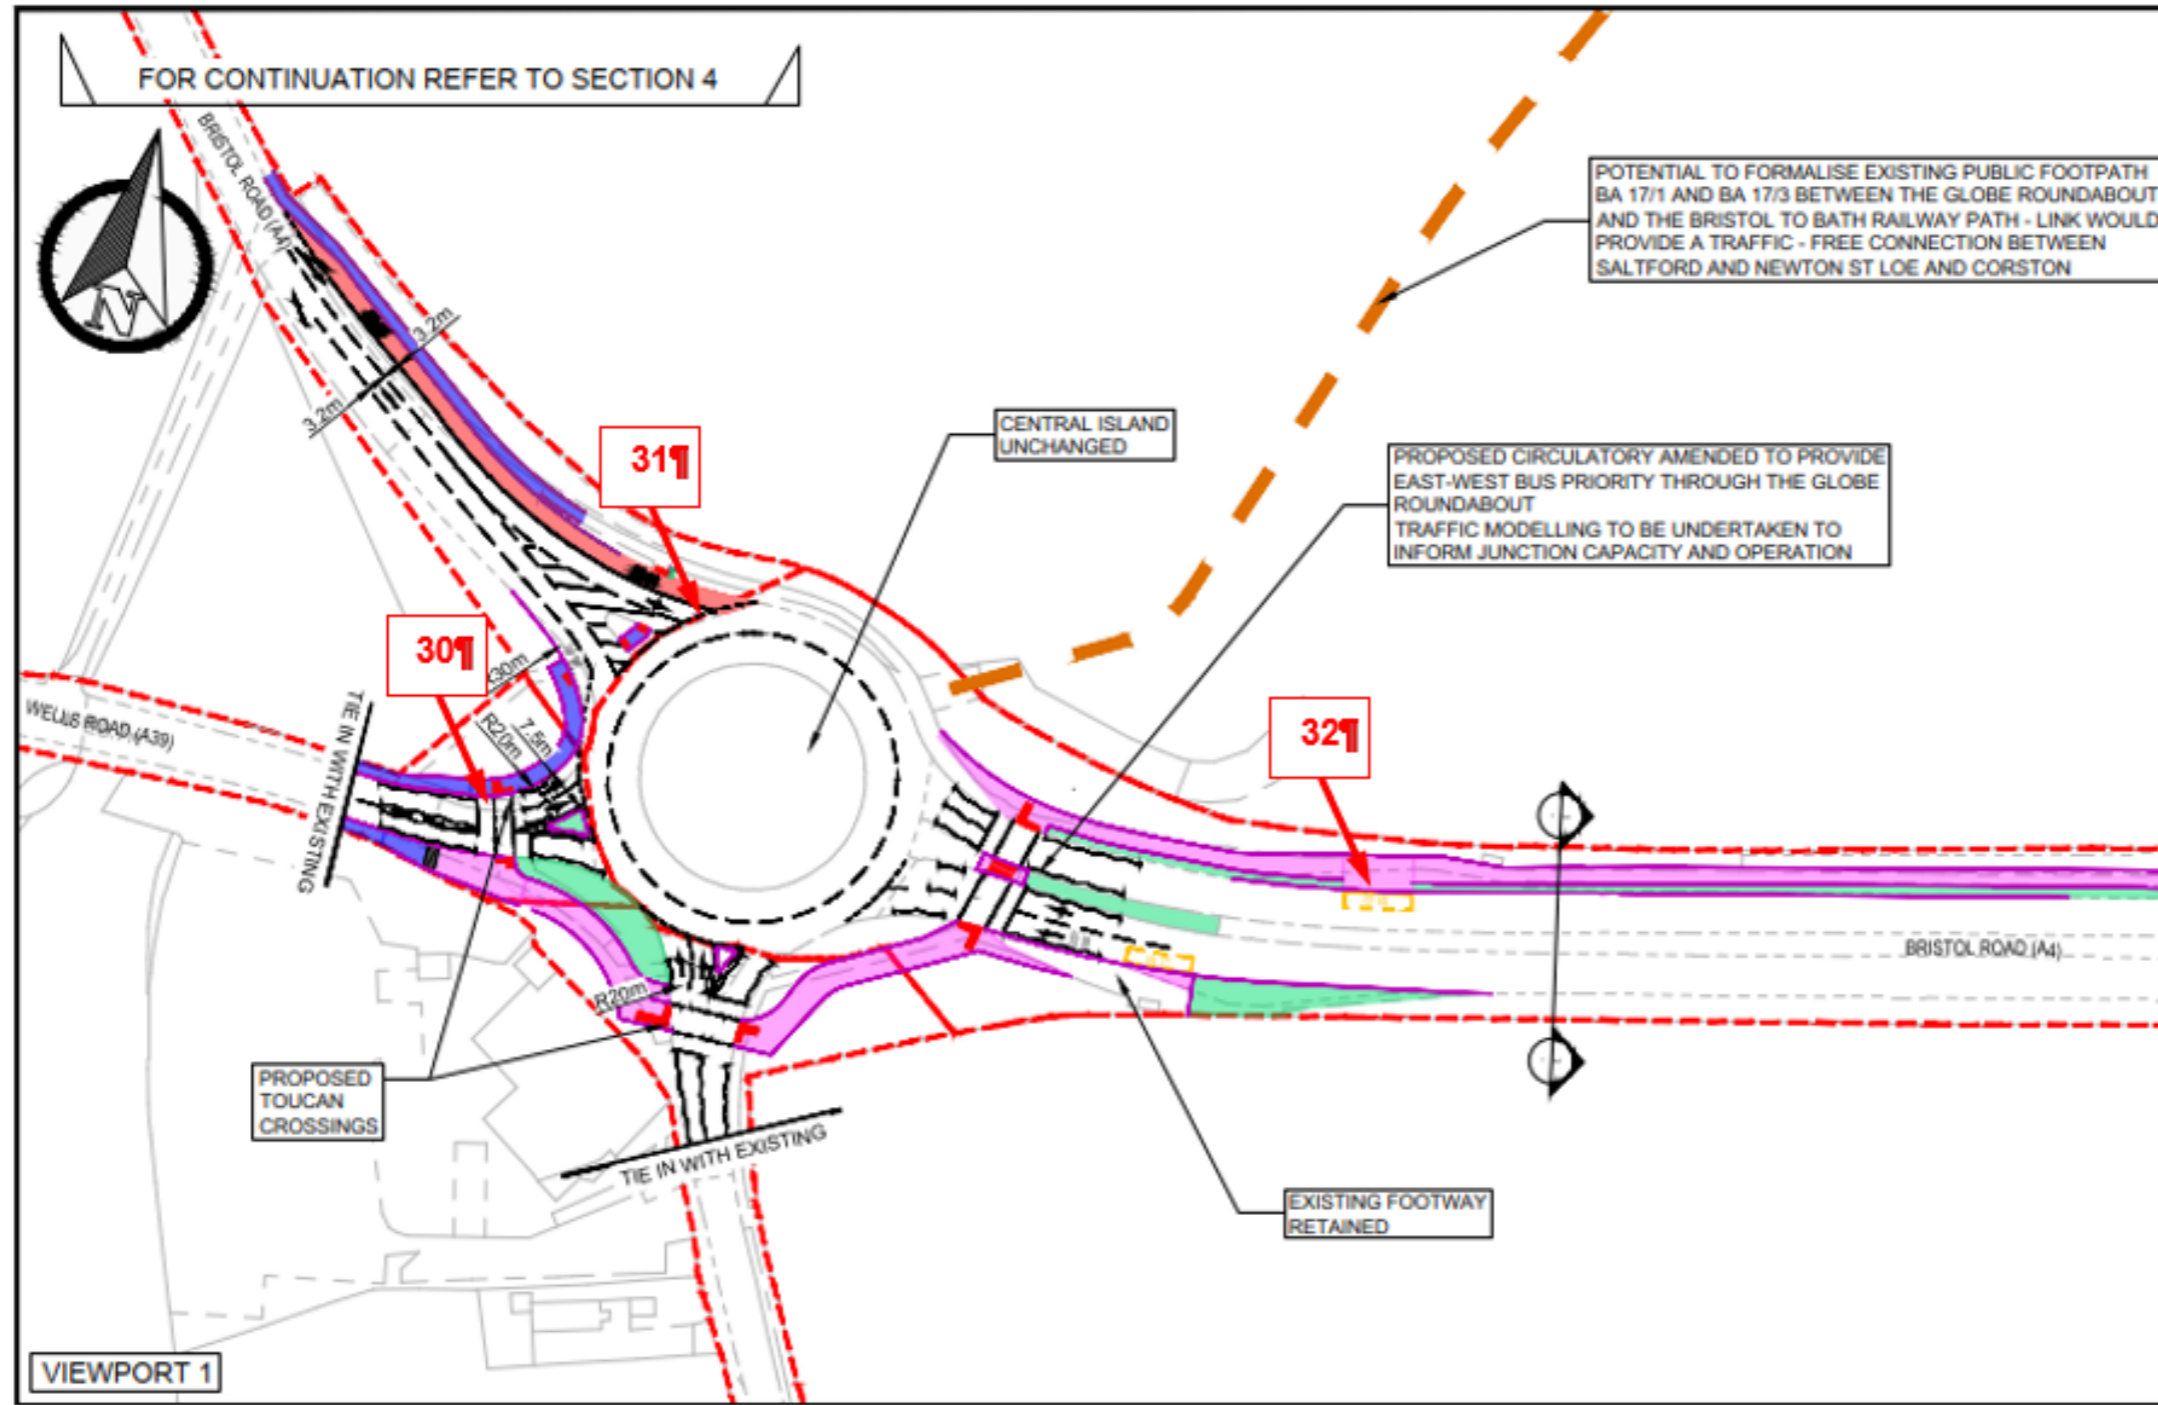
Section 6 Road Safety Audit Problem Location Plan
